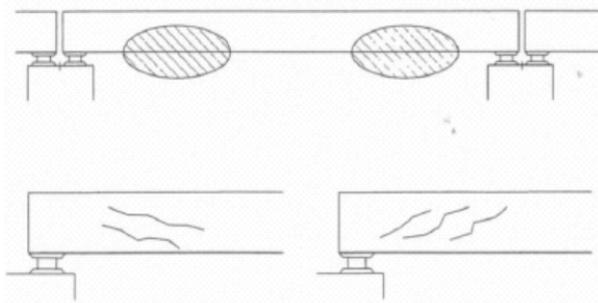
Shear cracks in Concrete Girder at 1/4 Point Of Span
